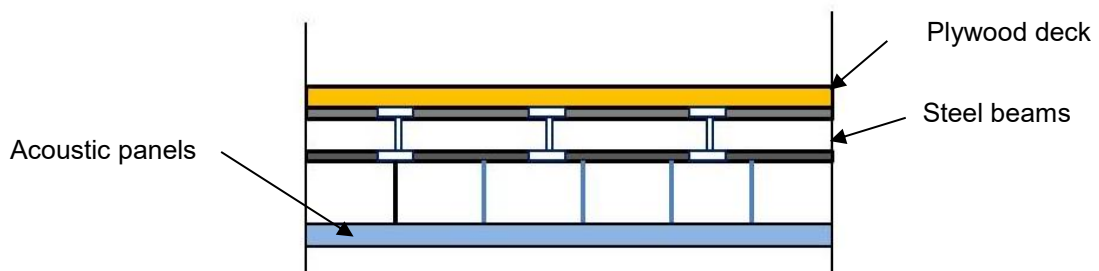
Floor detail design of the steel frame straw bale house. (reproduced from Cao *et al.* (2010))
